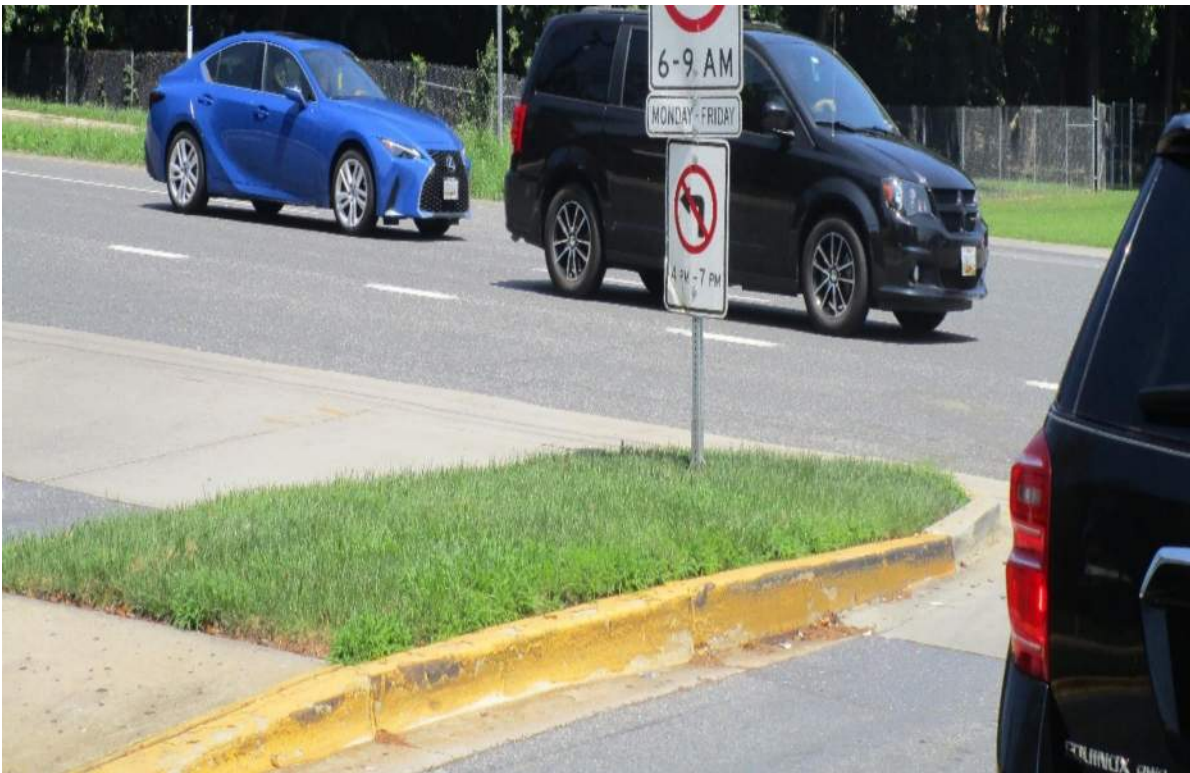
Curb and sidewalk damage – SW corner of Home Depot driveway.
